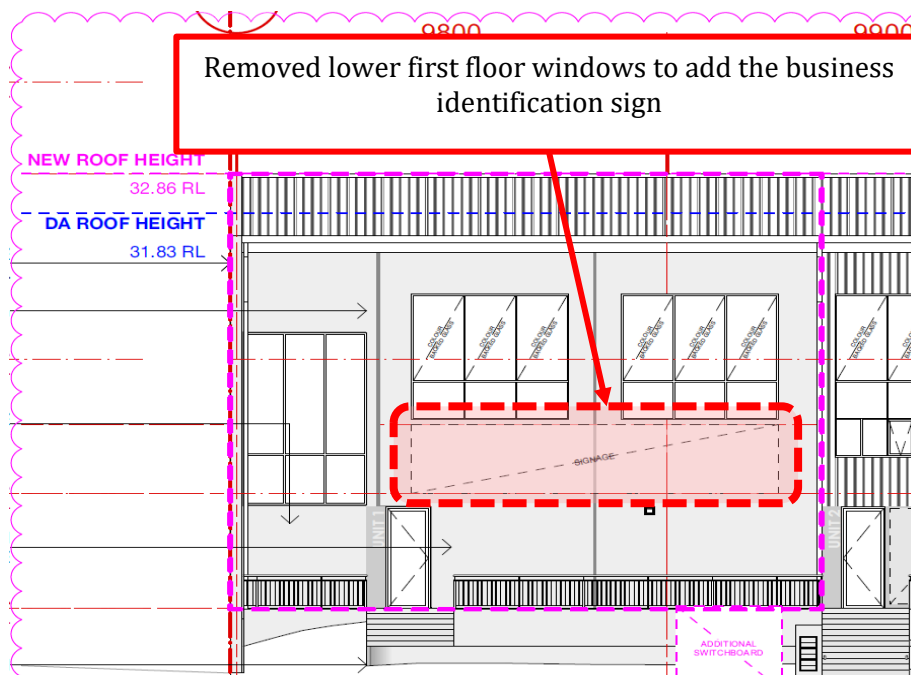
Extract of Modified North Elevation, Units 1-6 (Prepared by Architects Becerra)
